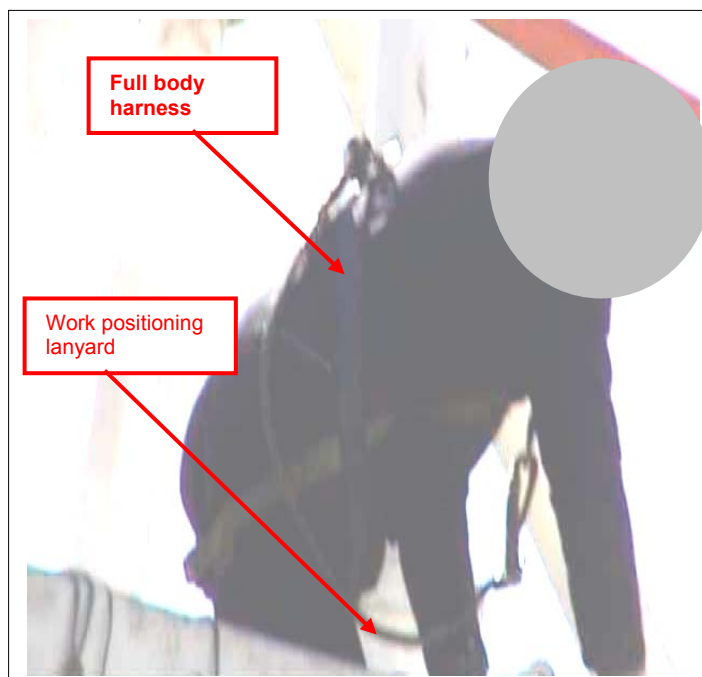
WORK POSITIONING LANYARD USED FOR FALL ARREST
